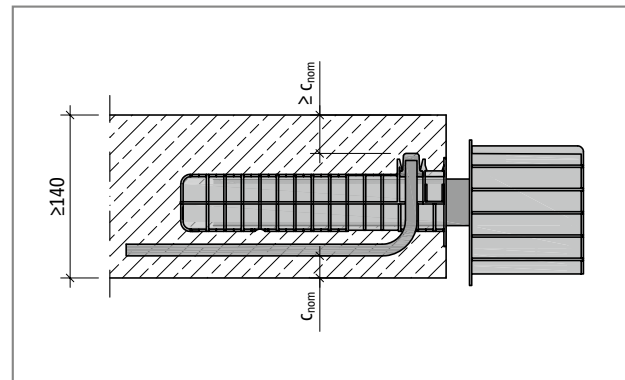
Schöck Tronsole® type Q: Installation with slab thickness $h \ge 140$ mm taking note of the concrete cover c_{nom}
